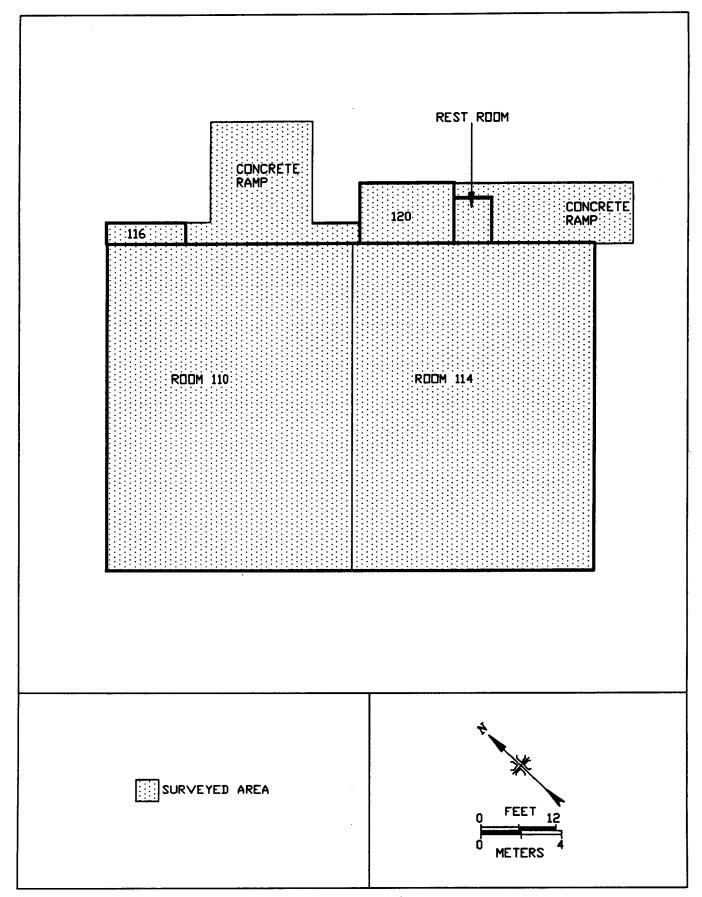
Building 064 - Floor Plan and Surveyed Areas
